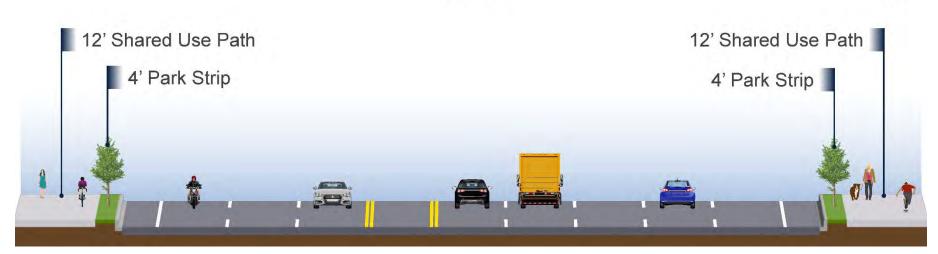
Shared Use Path Cross Section for Parrish Lane/400 North Option B Centerville
